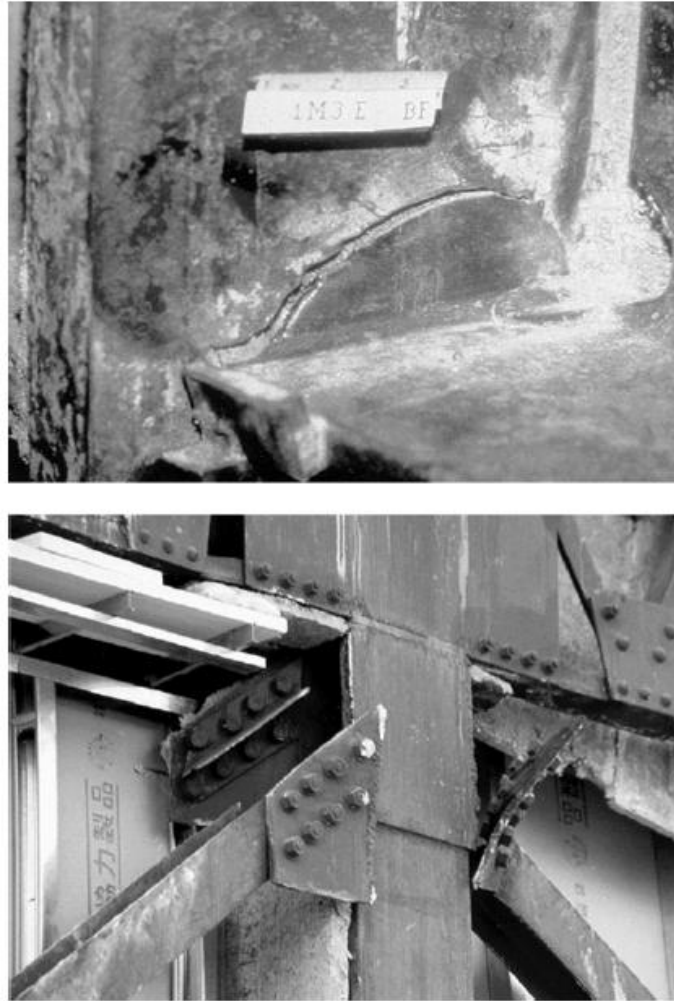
Fracture in beam-to-column connections in the Northridge earthquake (*top*) and web tear-out in bolted brace-to-column connections during the 1995 Kobe earthquake (*bottom*) (Di Sarno and Elnashai, 2009)
